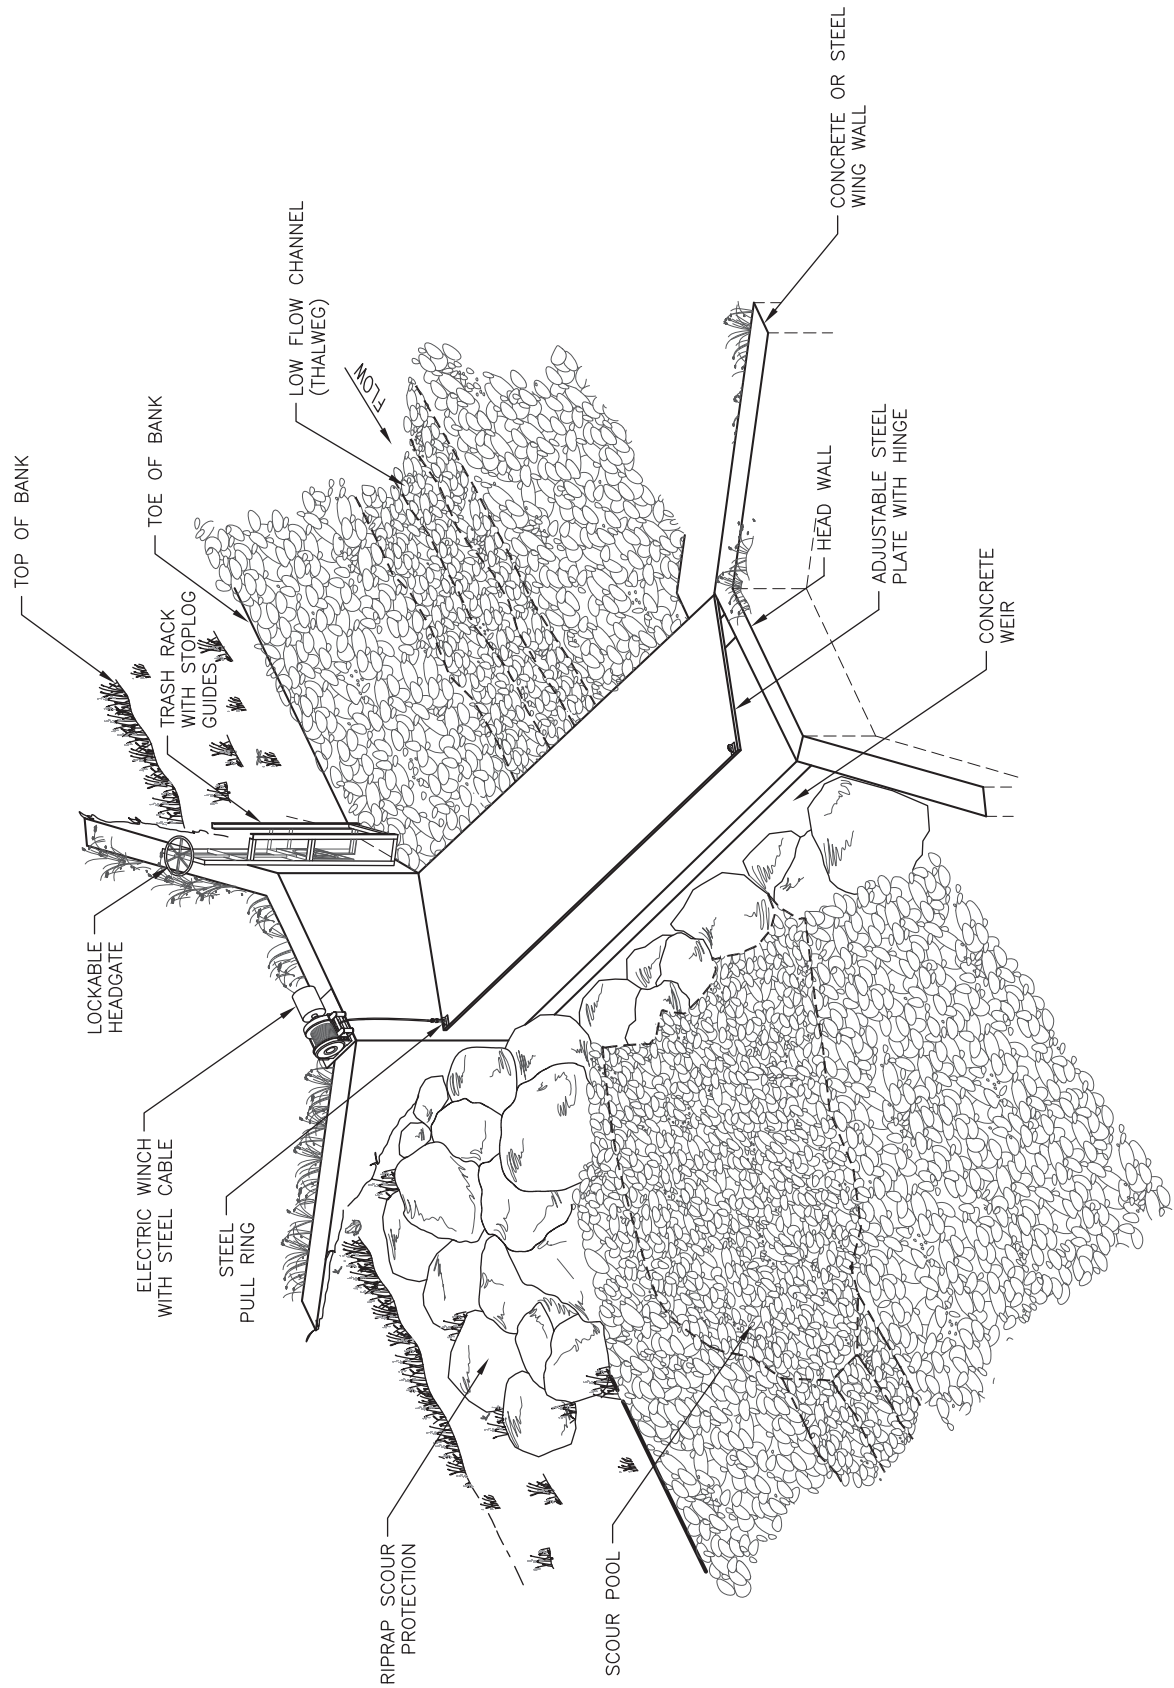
Schematic drawing of tilting weir with concrete sill and wingwalls.
